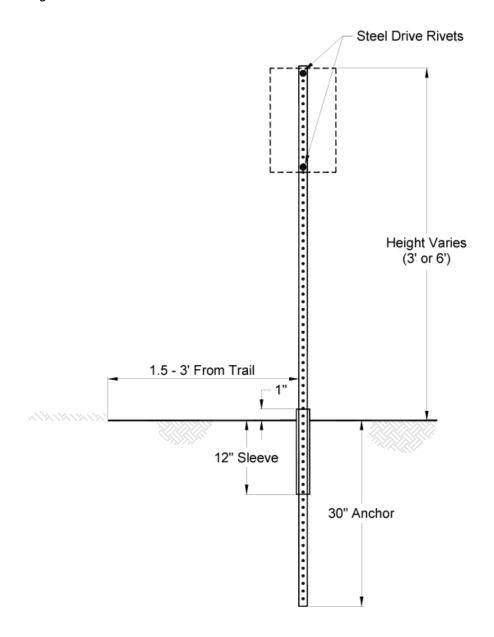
TRAIL SIGN INSTALLATION
